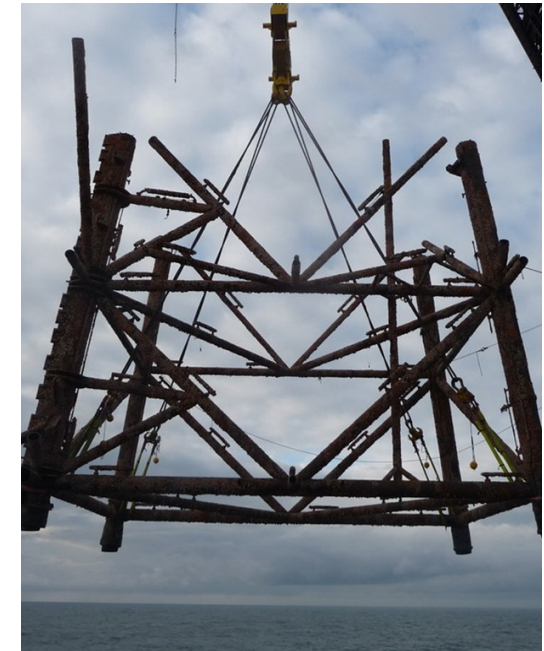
Lifting Attachments for Set 7 Jacket Bottom Section (LT method)
